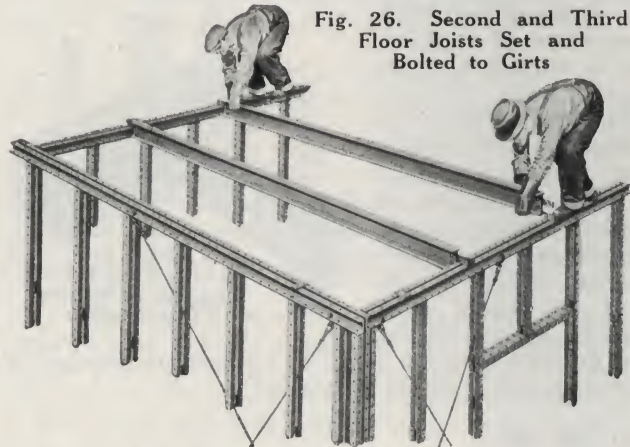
Second and Third Floor Joists Set and Bolted to Girts
